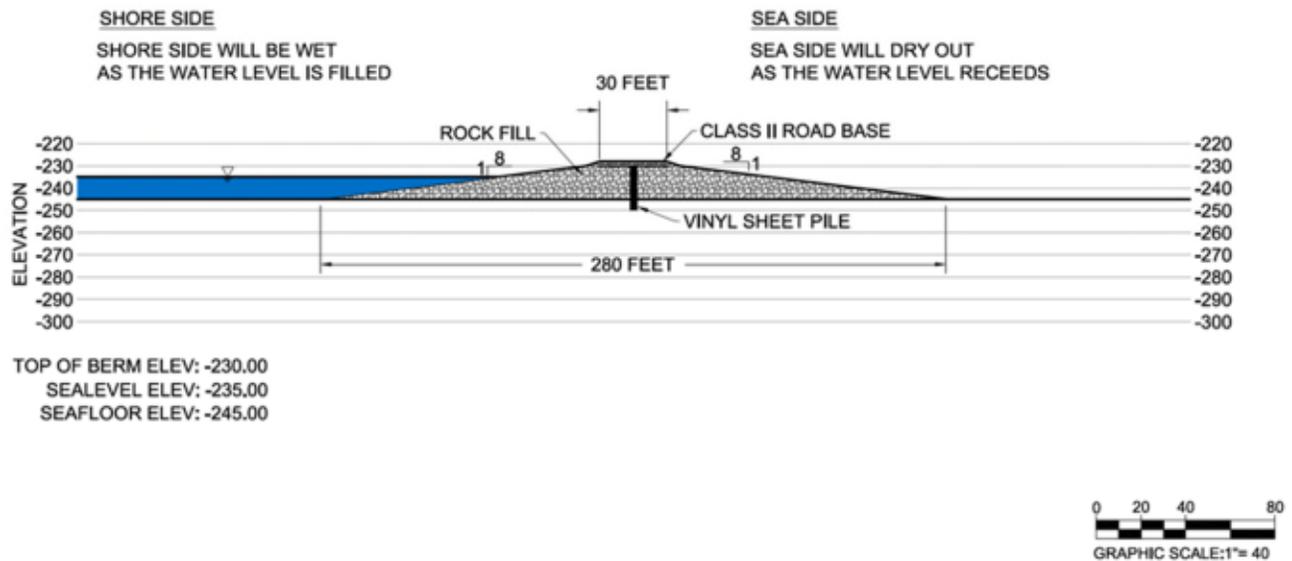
Vinyl Sheet Pile Levee at -245 ft NGVD
